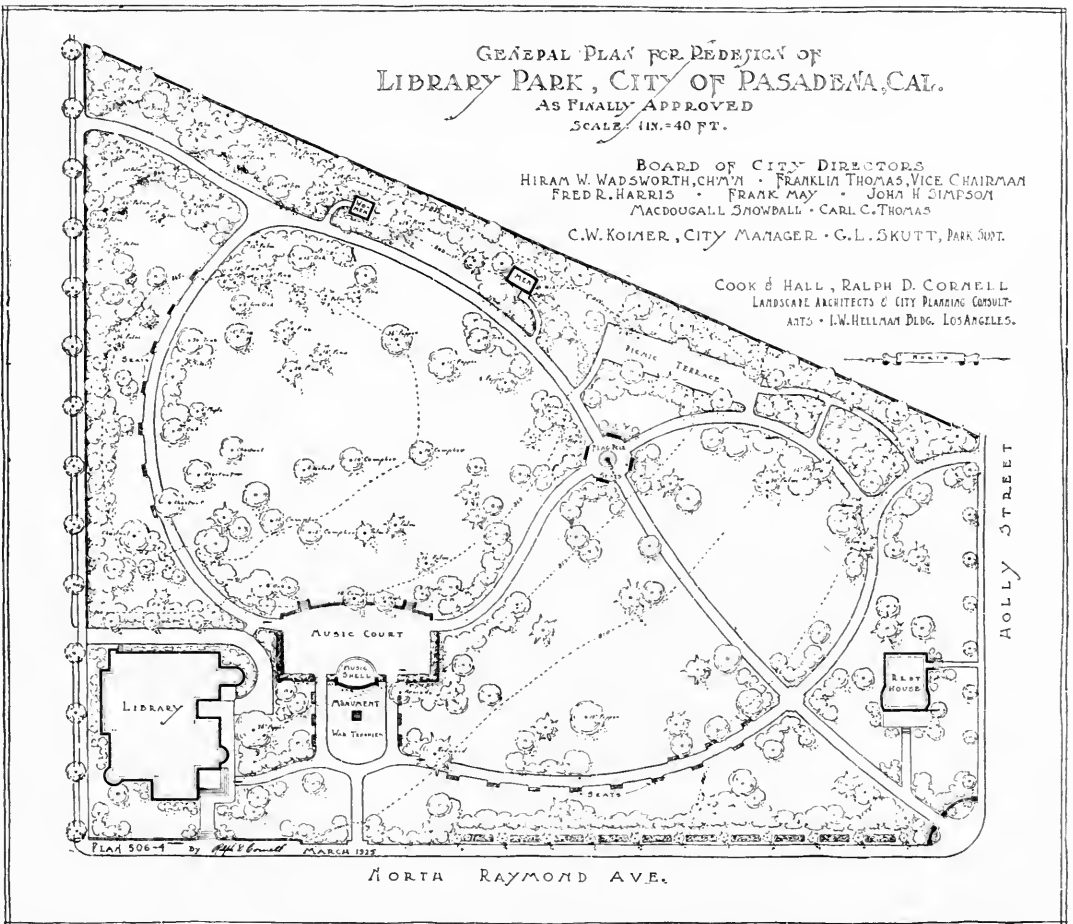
GENERAL PLAN OF LIBRARY PARK, PASADENA, CALIFORNIA
